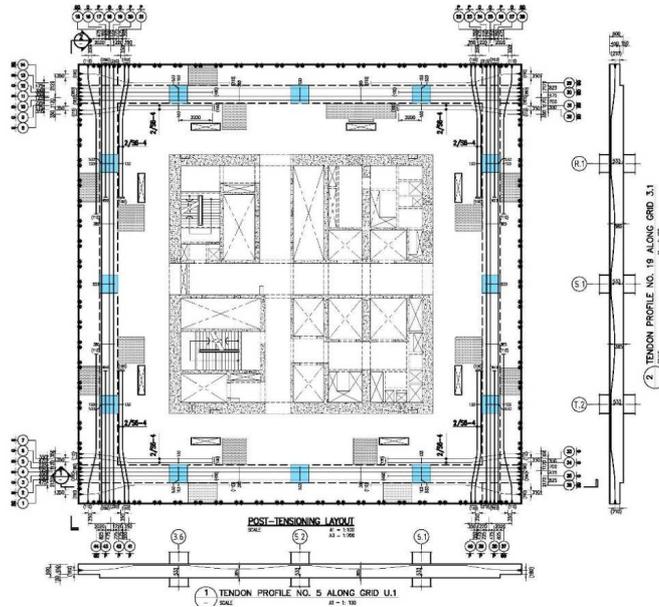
Post-tensioning layout (Source Bouygues-Thai)
